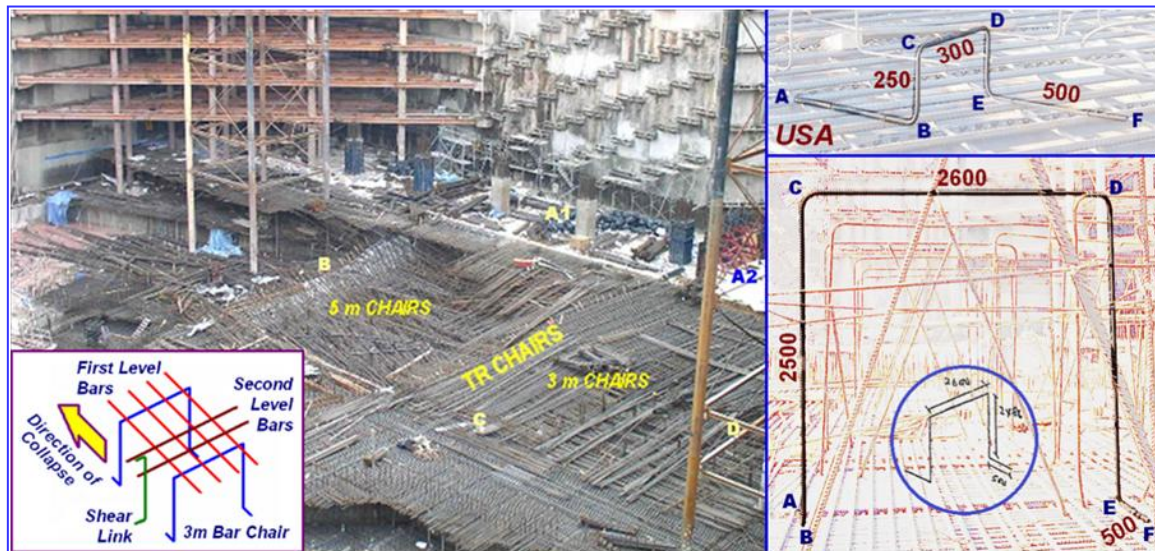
Left – Rebar cage collapse (Inset: Bar-chair and rebars); Right – Bar-chairs
